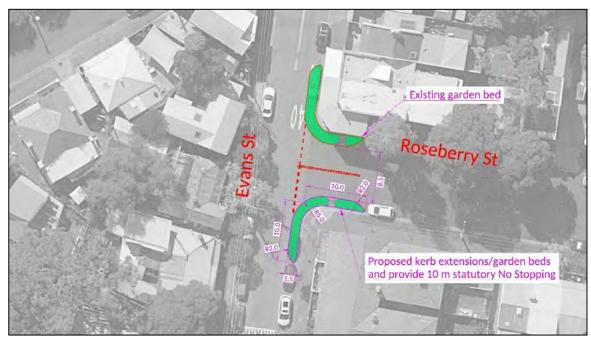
Evans Street / Roseberry Street intersection proposal.
